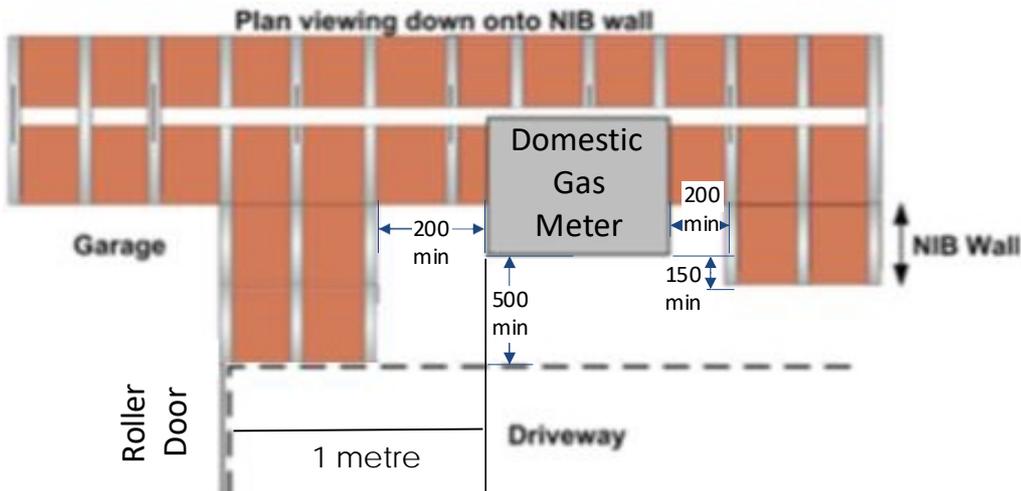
Plan View of NIB Wall - Domestic Meter Installation
